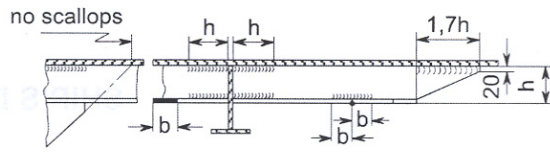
Welds at the ends of girders and stiffeners
